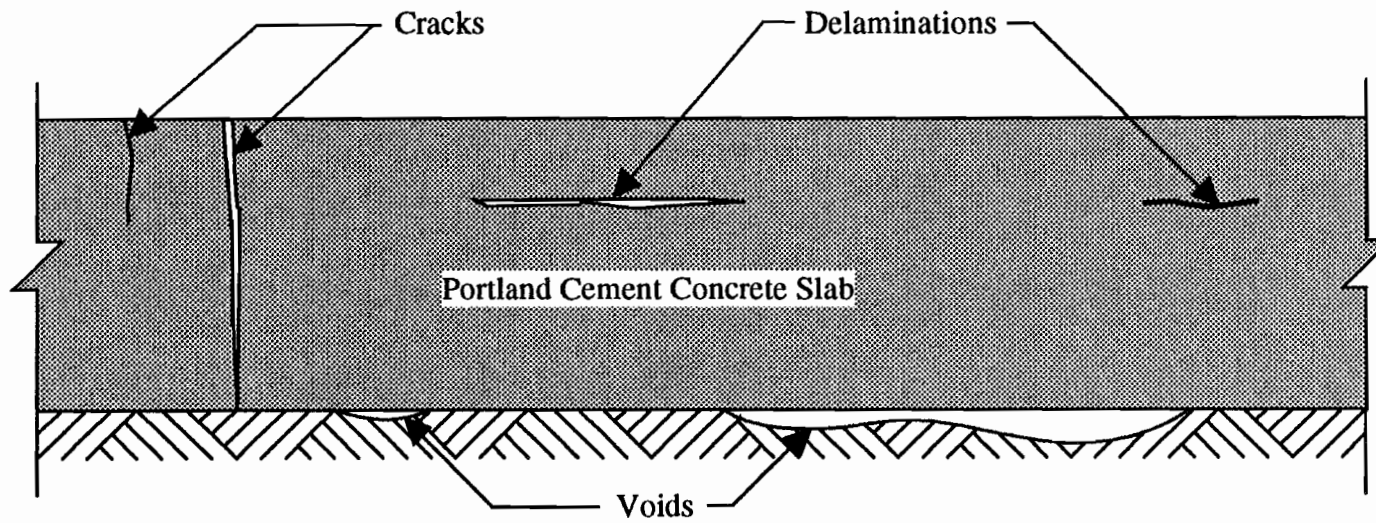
Illustration of Typical Cracks, Voids, and Delaminations and Their Relative Locations in a Rigid Concrete Pavement
